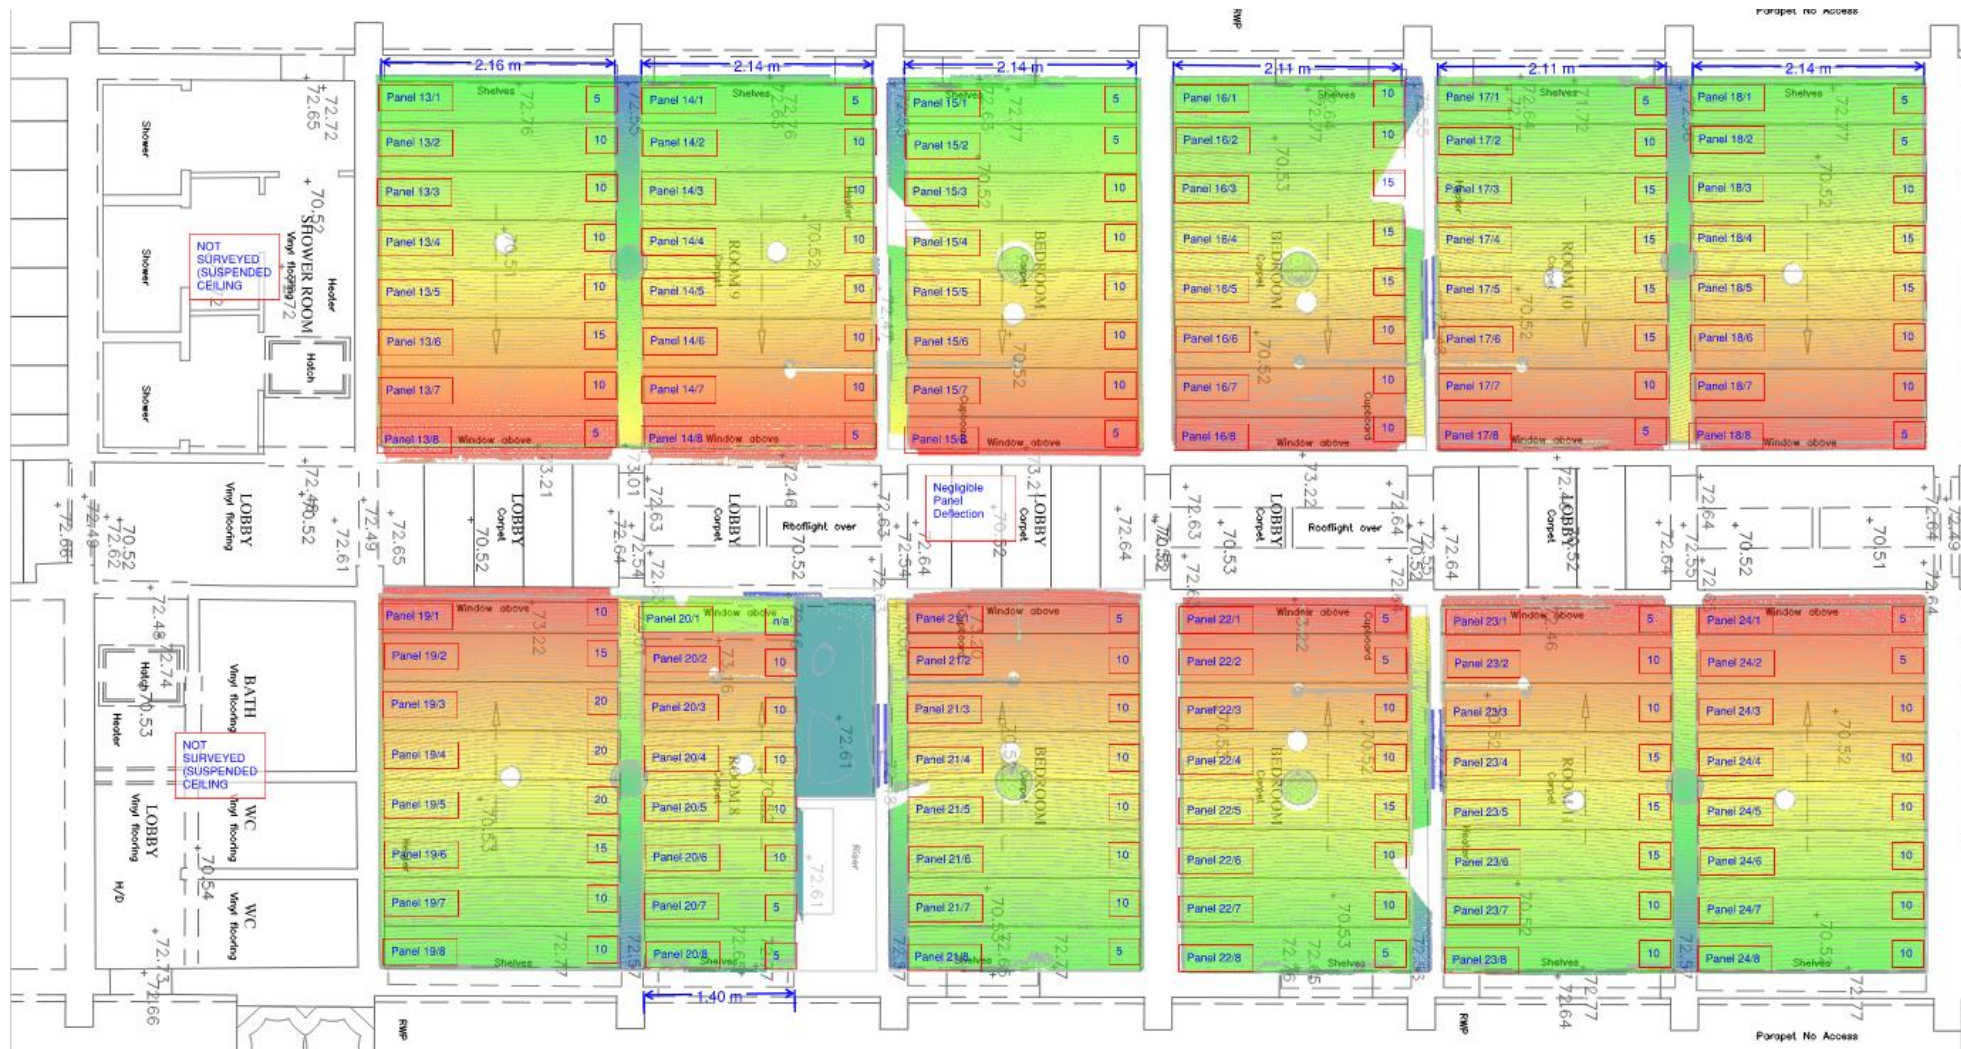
Batchelor’s Row – North – Roof Soffit Contours (James Brennan Assoc)
